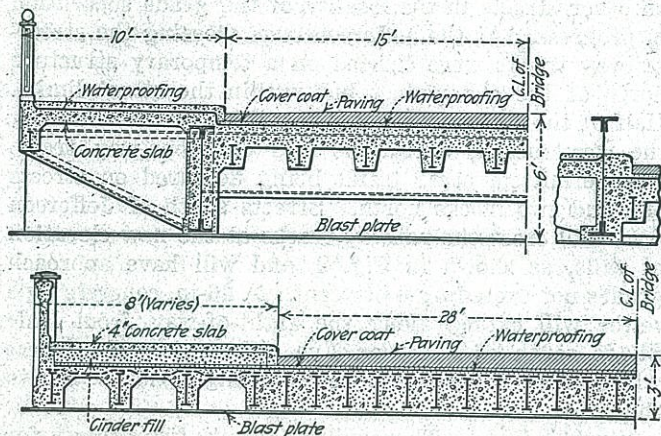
FLOOR CONSTRUCTION OF BRIDGES
